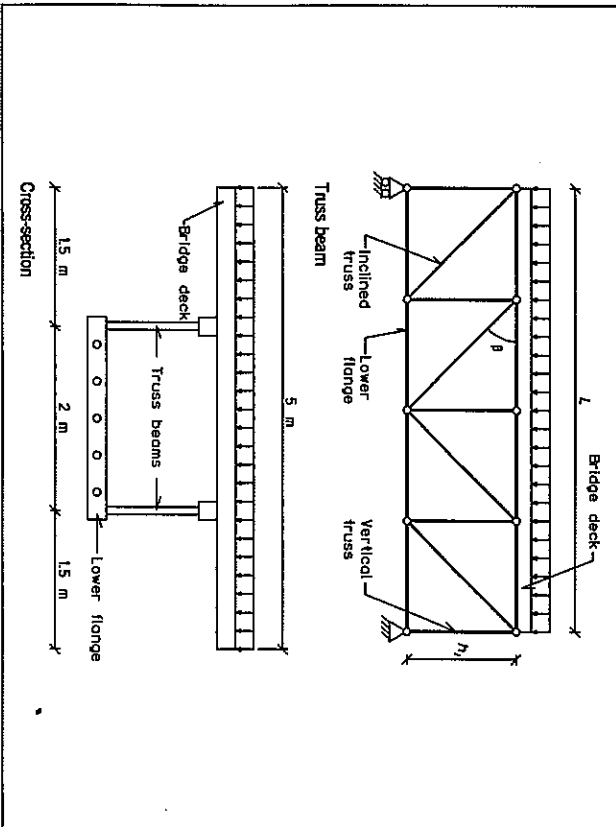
Structural model of prestressed solution. The webs of the box girder consist of plane truss beams.
